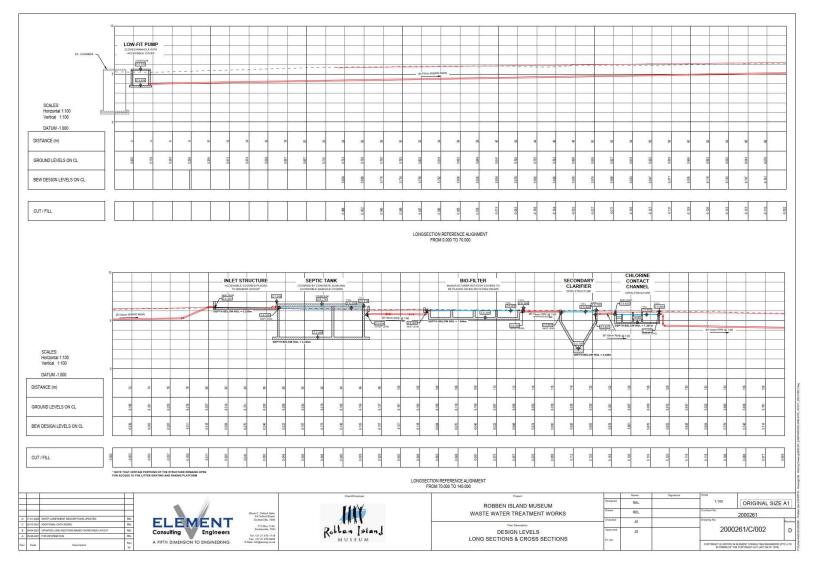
Cross-section of the Proposed WWTW Infrastructure
